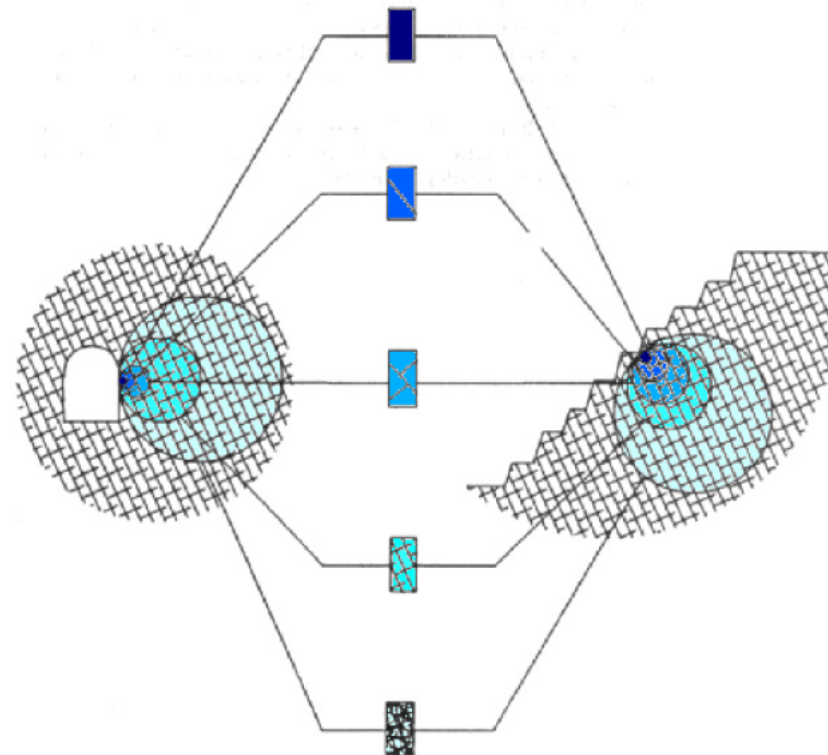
Discontinuities in rock and the engineered structure (A, borehole; B, tunnel; C, large excavation).
